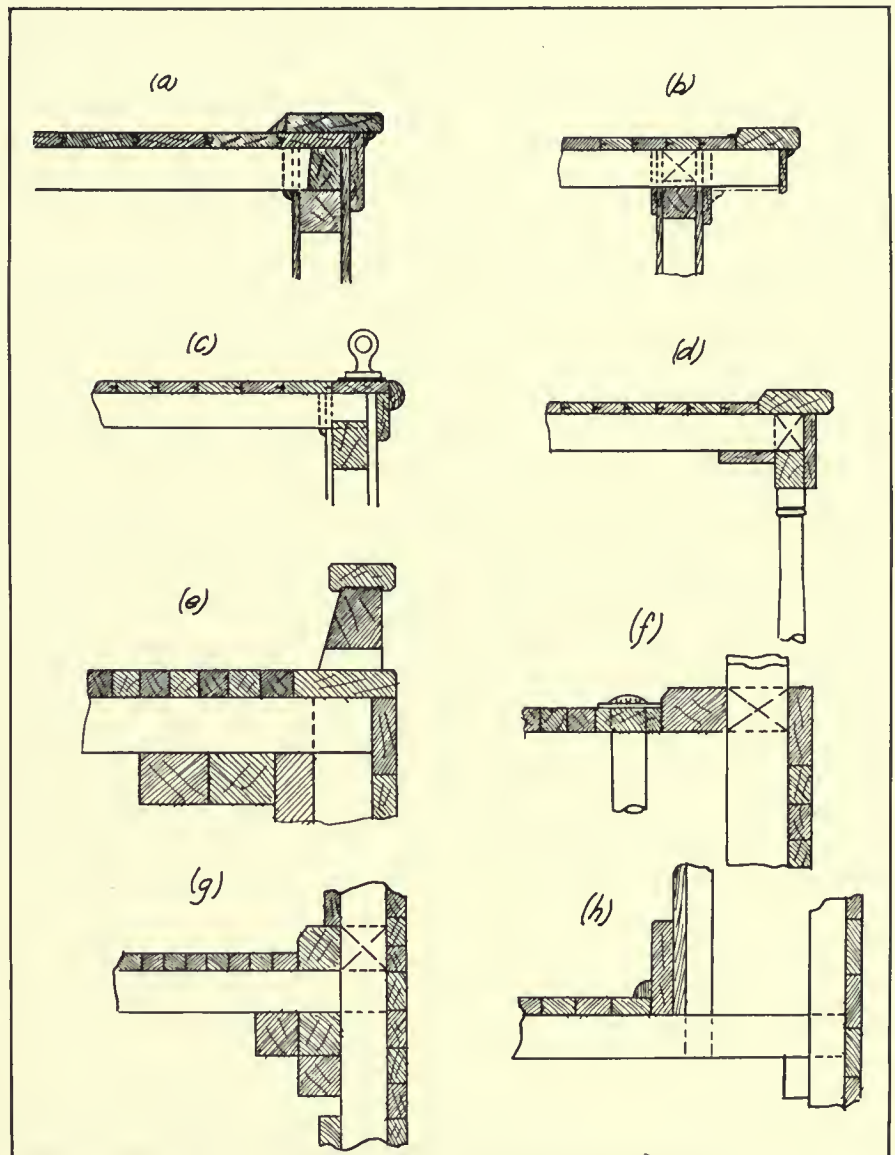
CROSS-SECTION OF WOODEN DECK CONSTRUCTION
